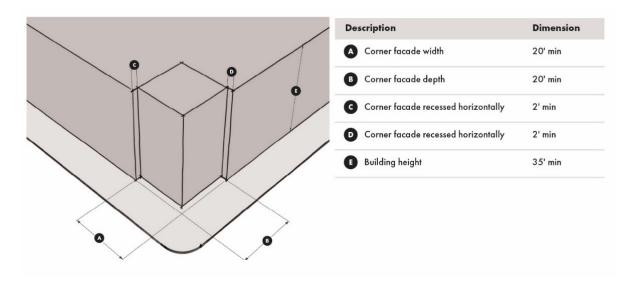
AA: Corner popped out from rest of façade.
